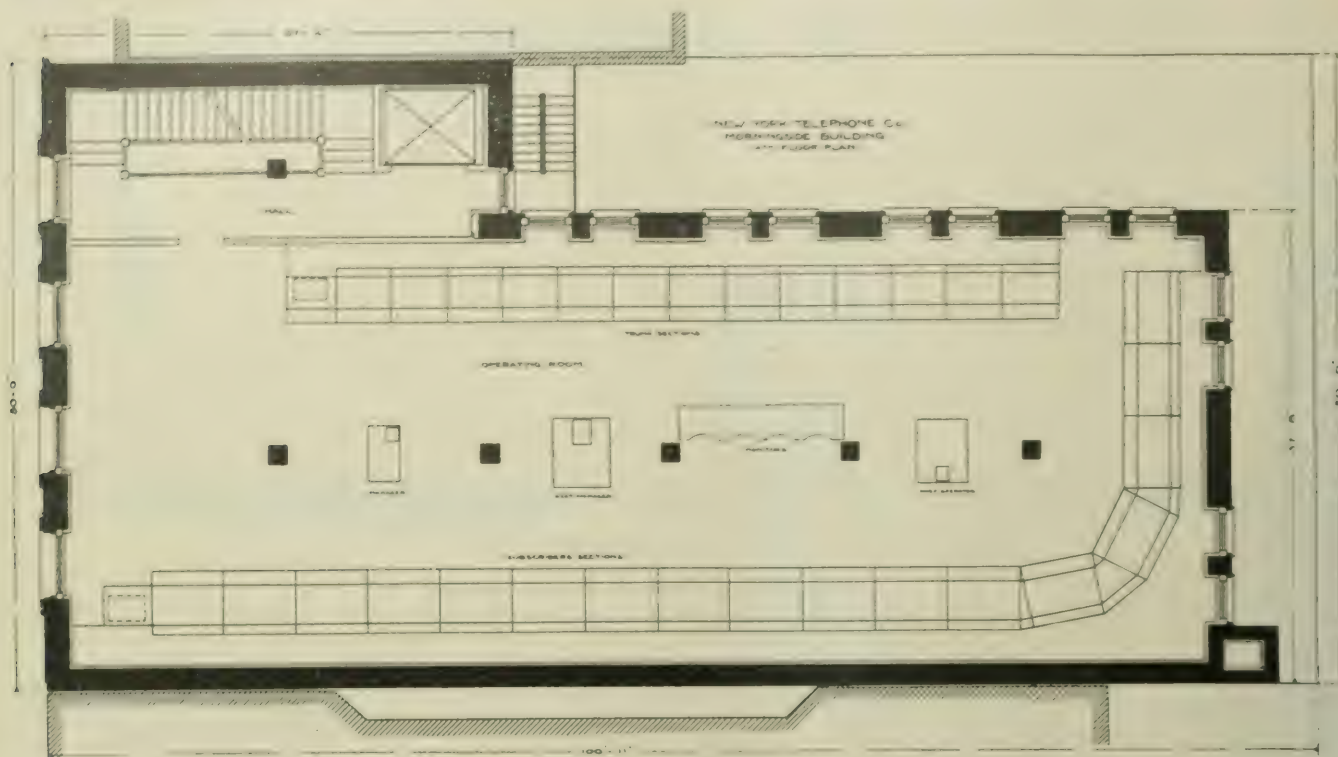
PLAN OF FOURTH FLOOR, MORNINGSIDE BUILDING.
